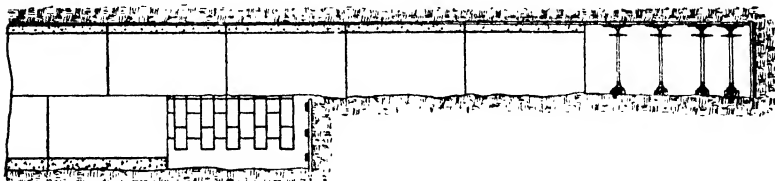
Flying arch method of tunneling. Top heading is advanced and concreted every day. The bench is removed under protection of the concrete arch, and invert and side walls are poured together three or four days later. (Courtesy of Commercial Shearing & Stamping Co.)
